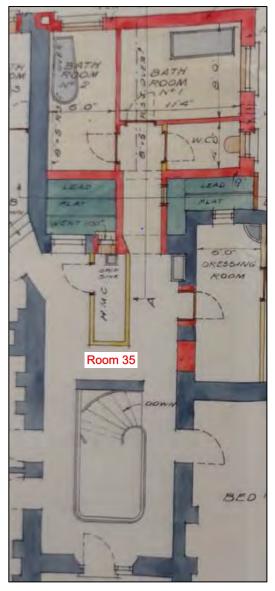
Extract from the 1929 plan showing Rooms 34, 35 and 36 (BARS ref: RDB P 1/1314)
